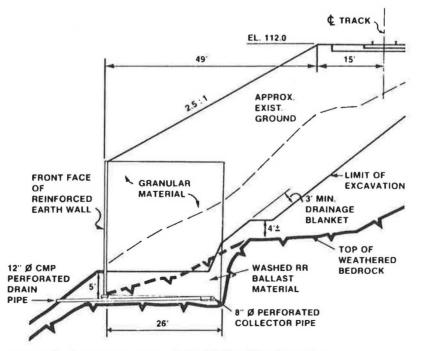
Typical cross section of Clinchfield stabilization project.
